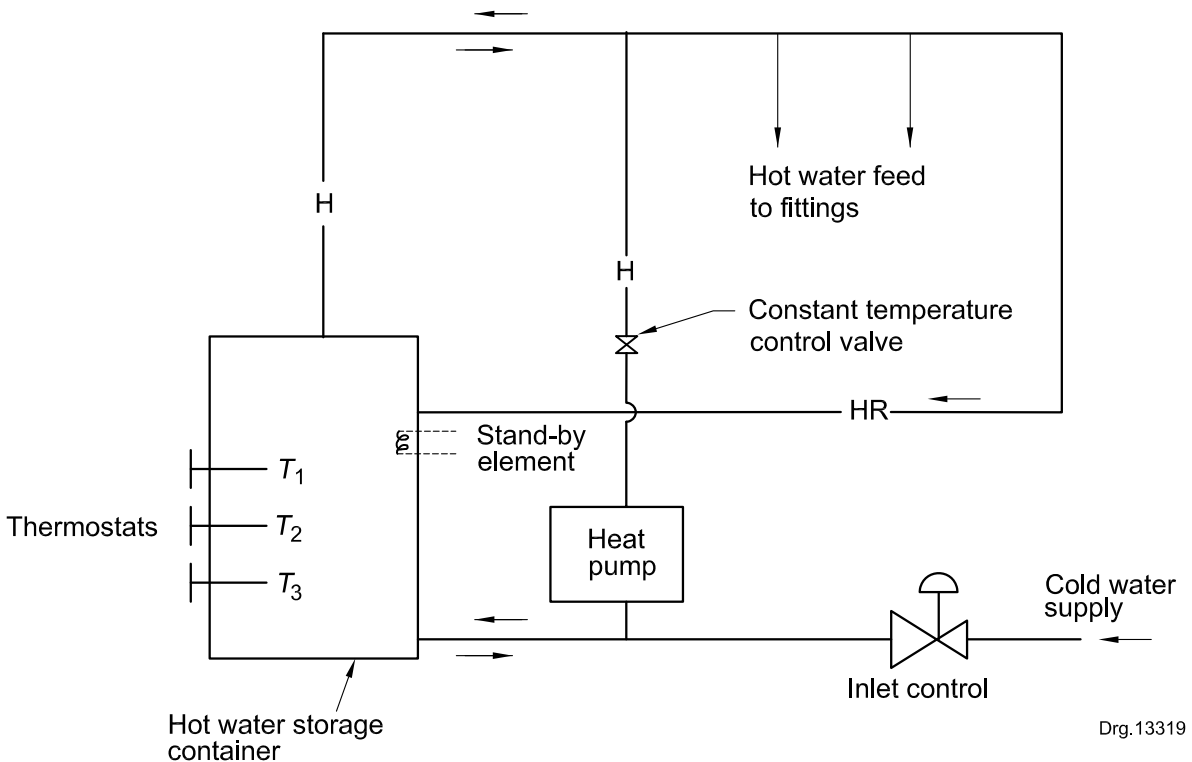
Schematic layout of a typical hot water system incorporating a heat pump
